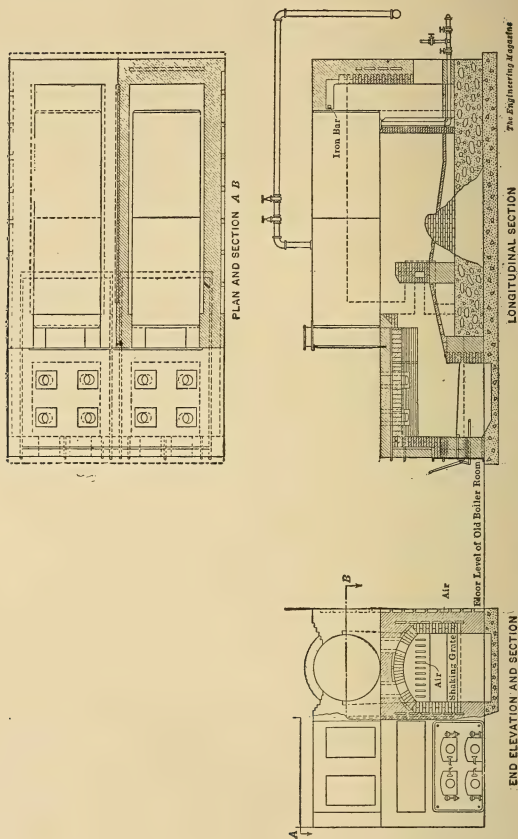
FURNACE FOR BURNING MIXTURE OF TAN BARK AND COAL
